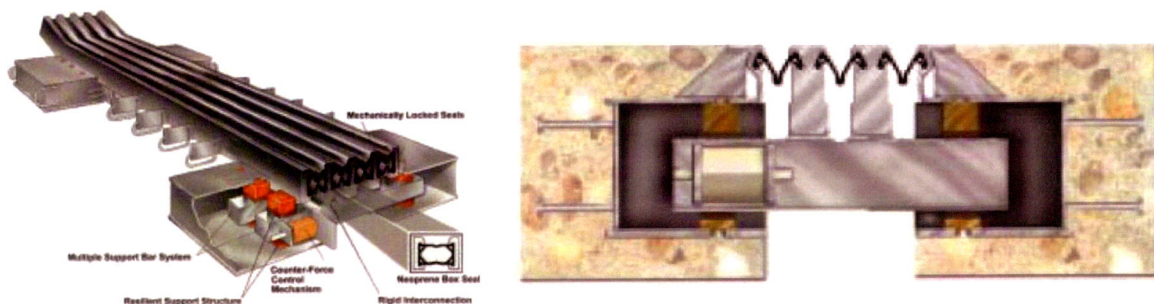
Left: 3D view of the Modular D joint; Right: Cross sectional view of a crossbeam.
